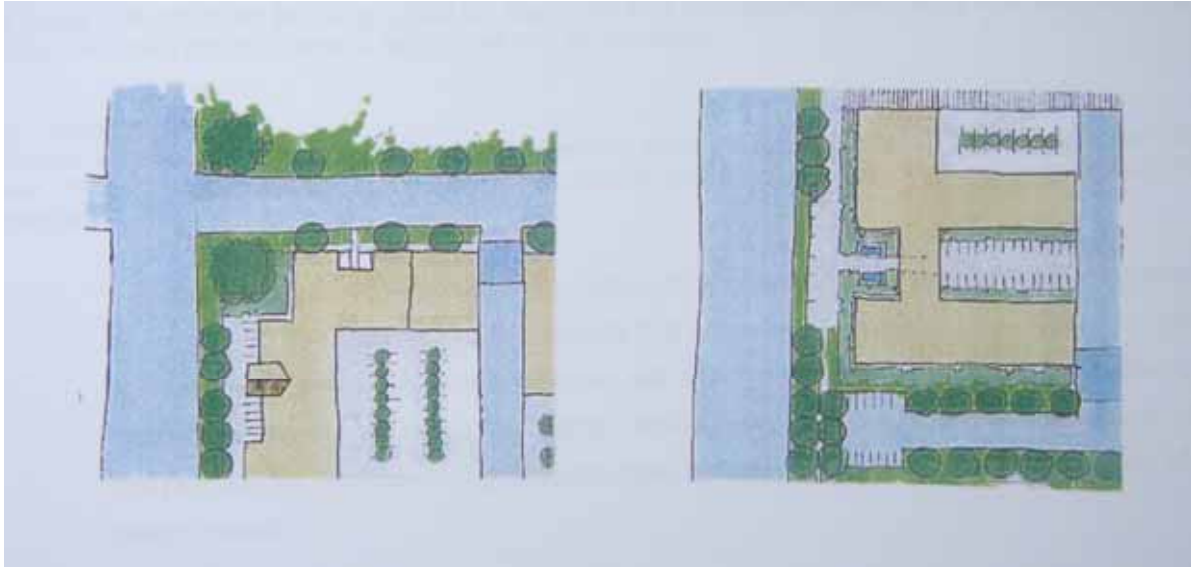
Diagram demonstrating how buildings can be used to define spaces
